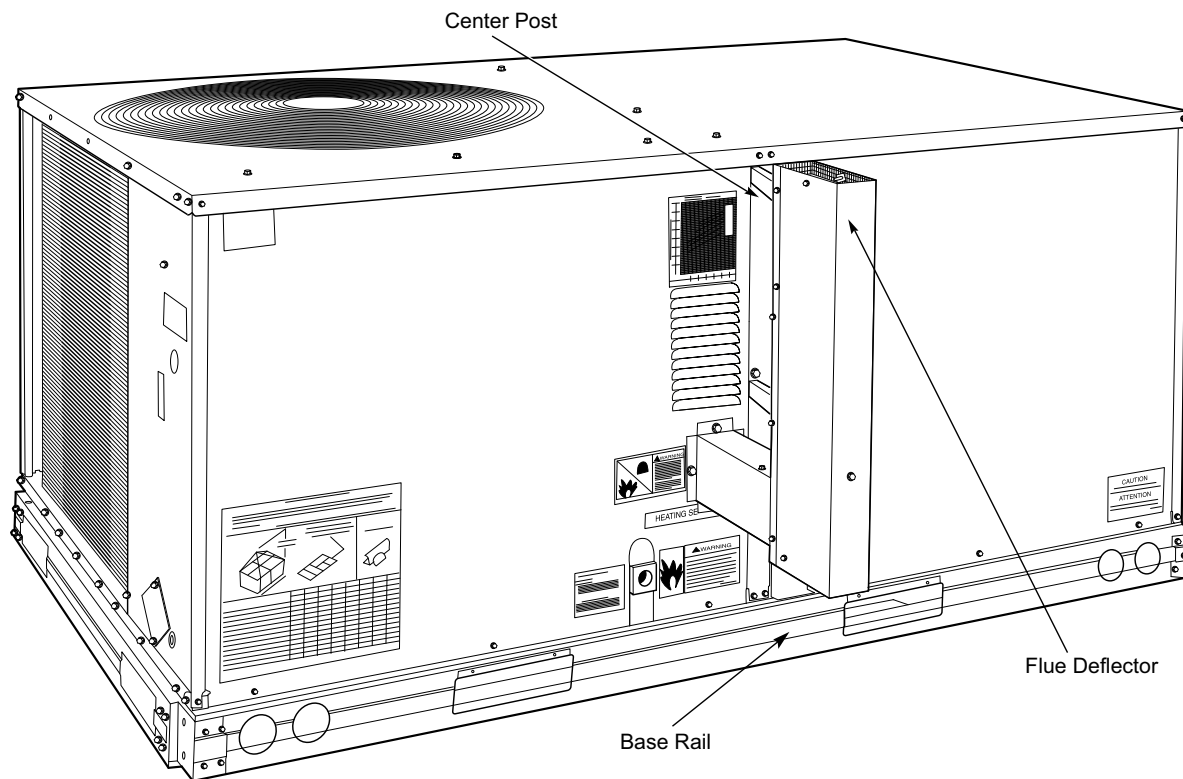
Flue Discharge Deflector Assembly (Back View)
